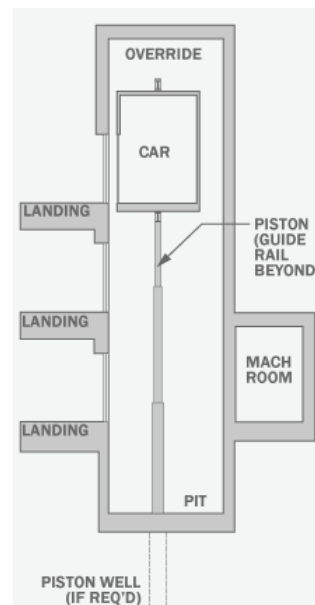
Hydraulic Elevator Diagram (Source: Archtoolbox)
